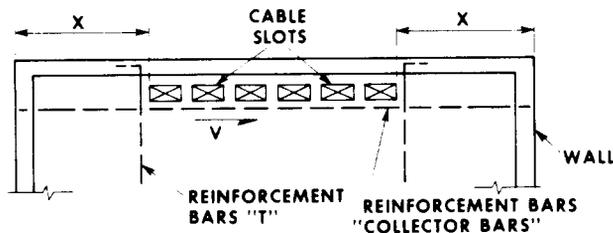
Common Configuration of Telephone Building Showing the Collector Reinforcing Bars Needed for Shear Force Transfer
